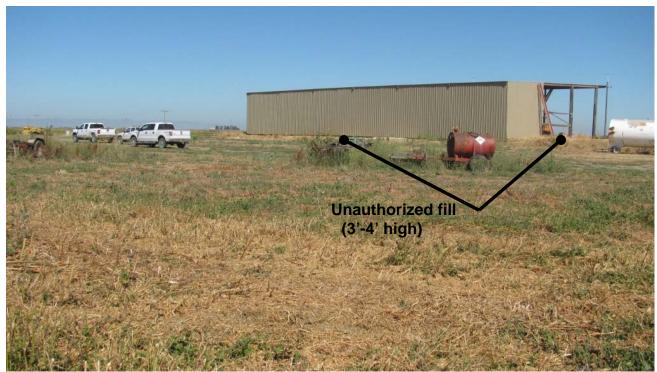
Existing structure and fill in Yolo Bypass (Source: Board staff site visit 8.15.2011)
